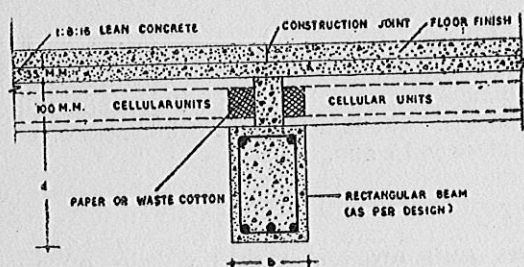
(a) Cellular Units Roof/Floor with Rectangular Beam
